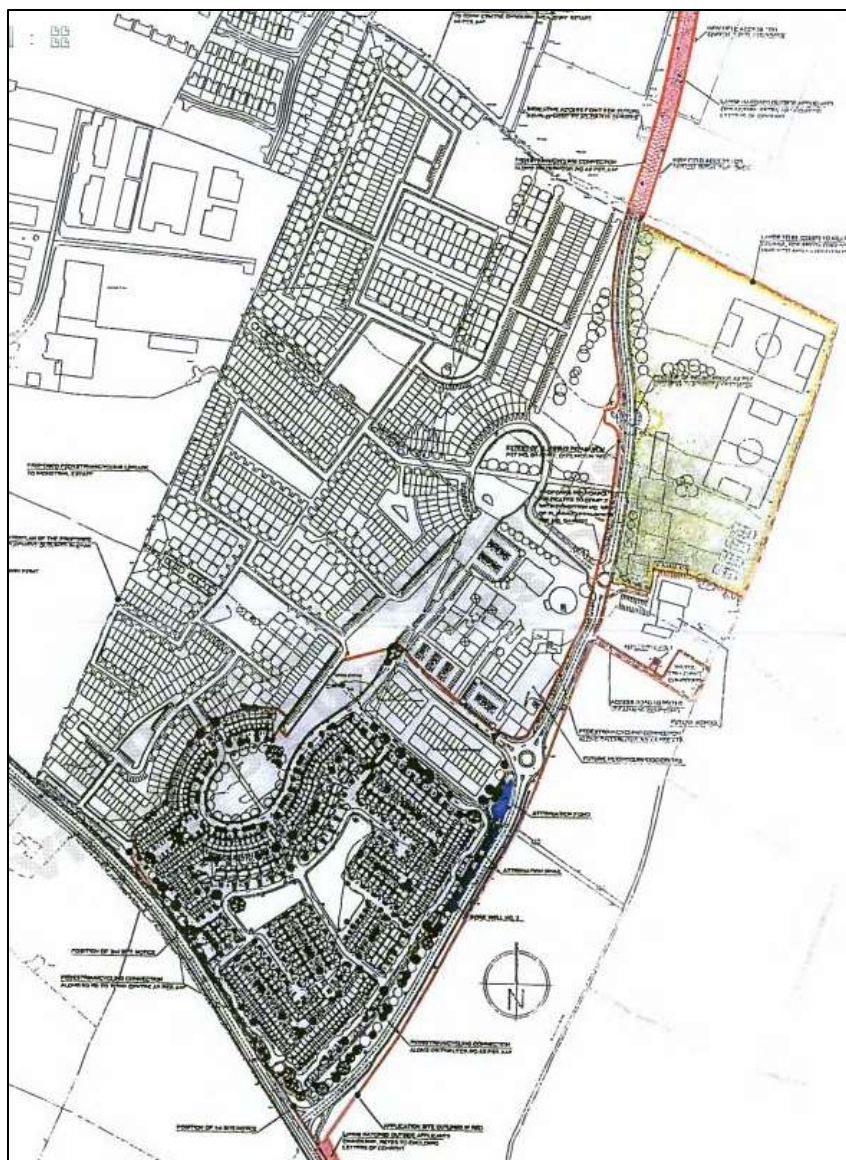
Site layout plan showing former masterplan proposals for the overall landholding
